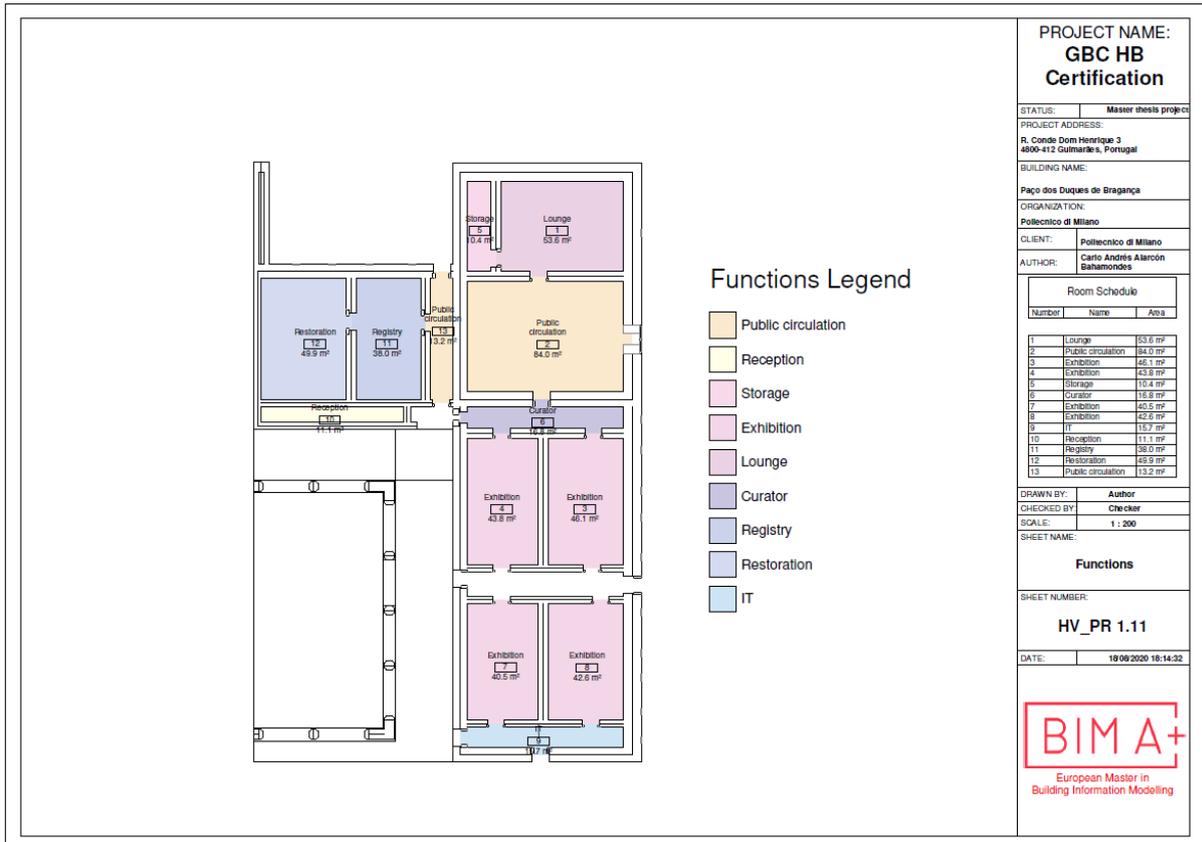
View sheet showing the building functions on the ground floor plan. Source: author.
